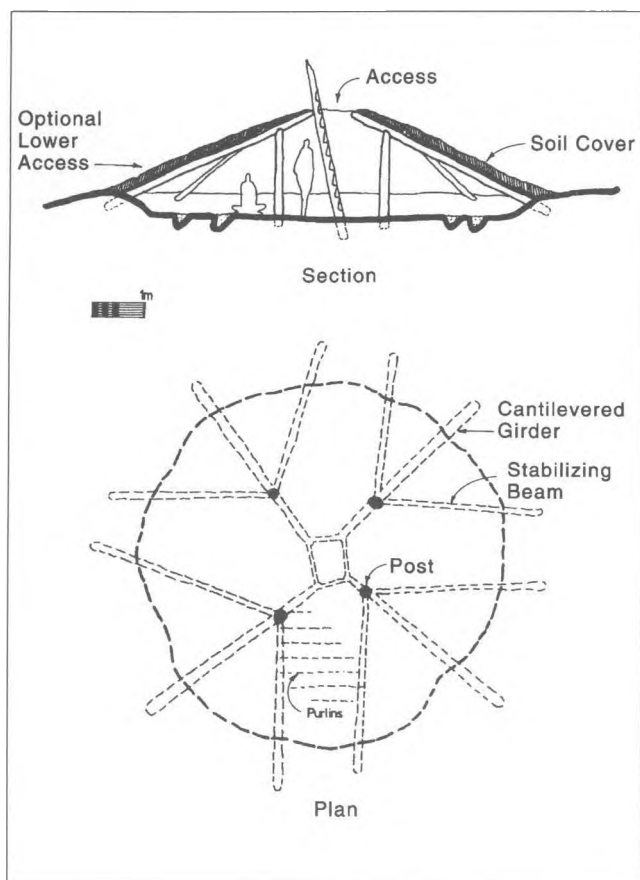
Structural Strategies Type: A Post, Girder and Beam
